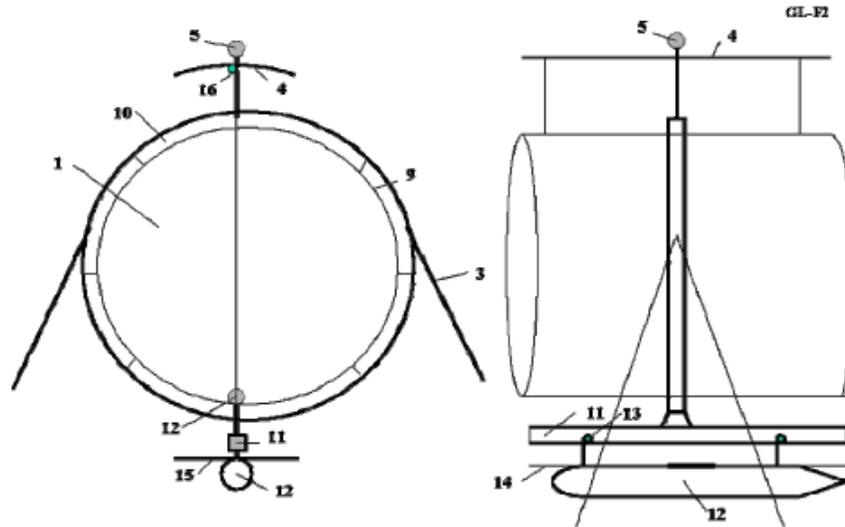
Gross-section and support ring of aerial natural gas pipeline. (a) front view, (b) side view. *Notations:* 9 - double casing, 10 - rigid ring, 11 - monorail, 12 - wing load container, 13 - rollers of a load container, 14 - thrust cable of container, 15 - container wing. Other notations are same Figure 1.
